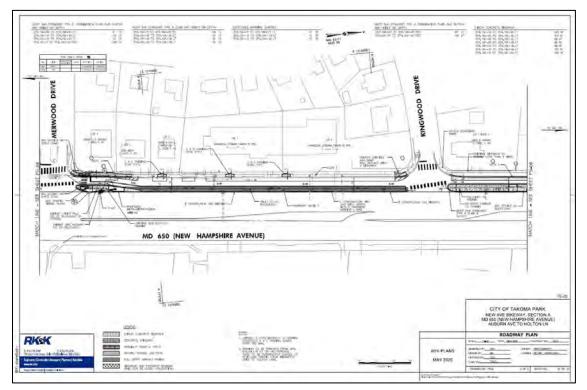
Plan View of Proposed New Avenue Section A Improvements (Part 5)
